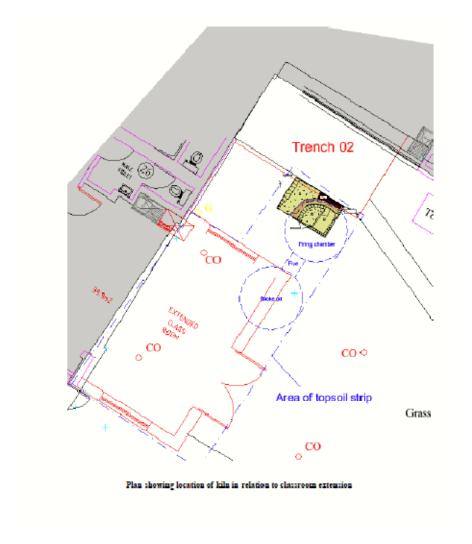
Plan showing position of trial trench, possible location of kiln stoke pit and area to be stripped for excavation (dash-dot blue line)
